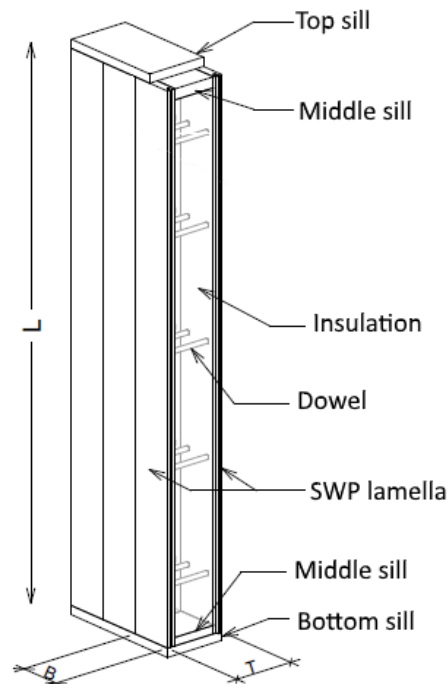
Construction details of Termowood wall. Source:Termowood (2017)
